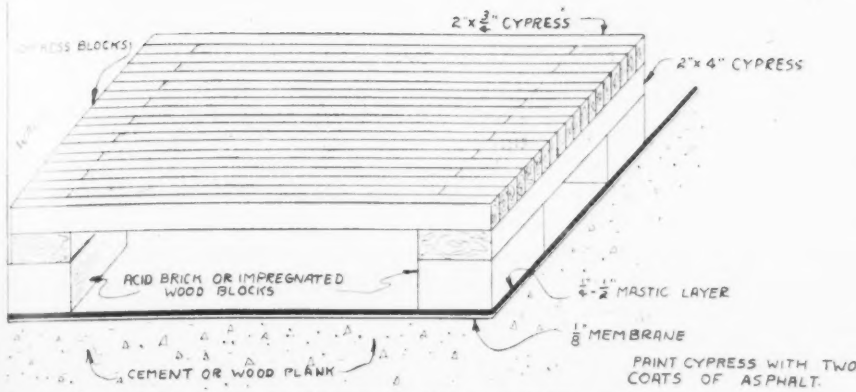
ASPHALT MASTIC FLOOR ON CONCRETE AND DUCKBOARD FLOOR
